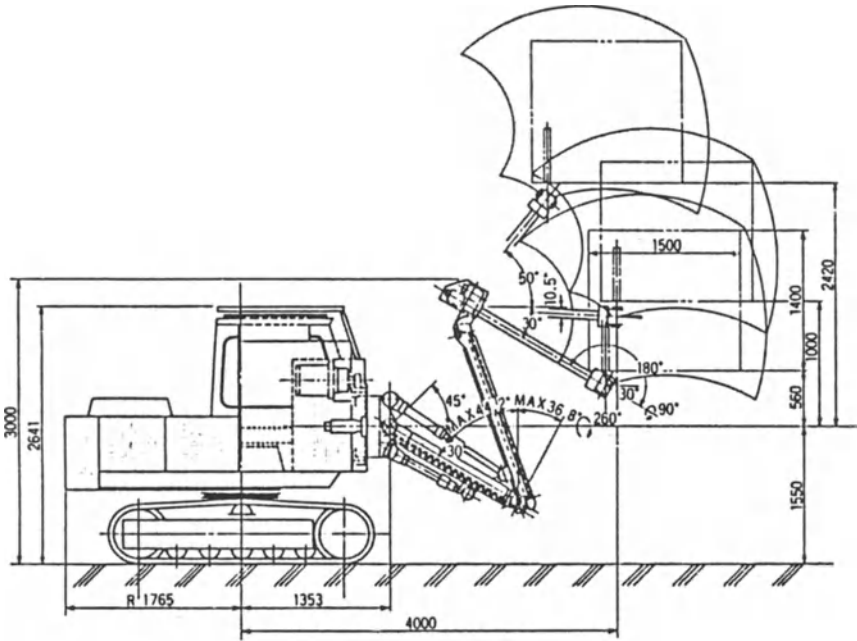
Outer dimensions of the automatic concrete sprayer (*Kobe Steel*)
